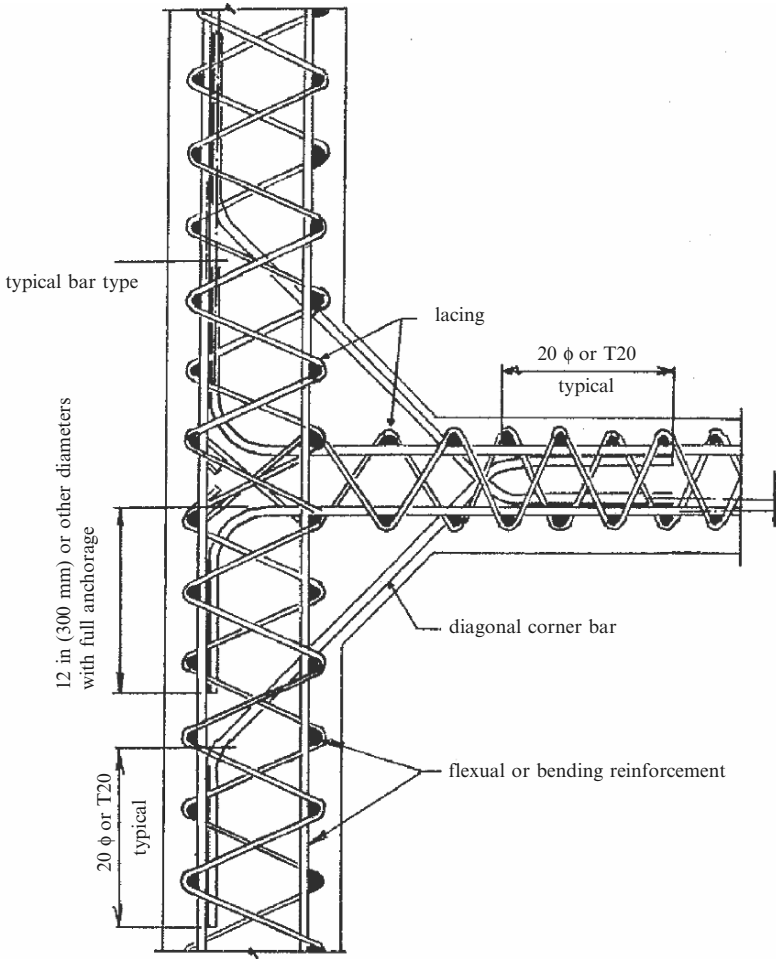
Typical detail at intersection of continuous and discontinuous walls
